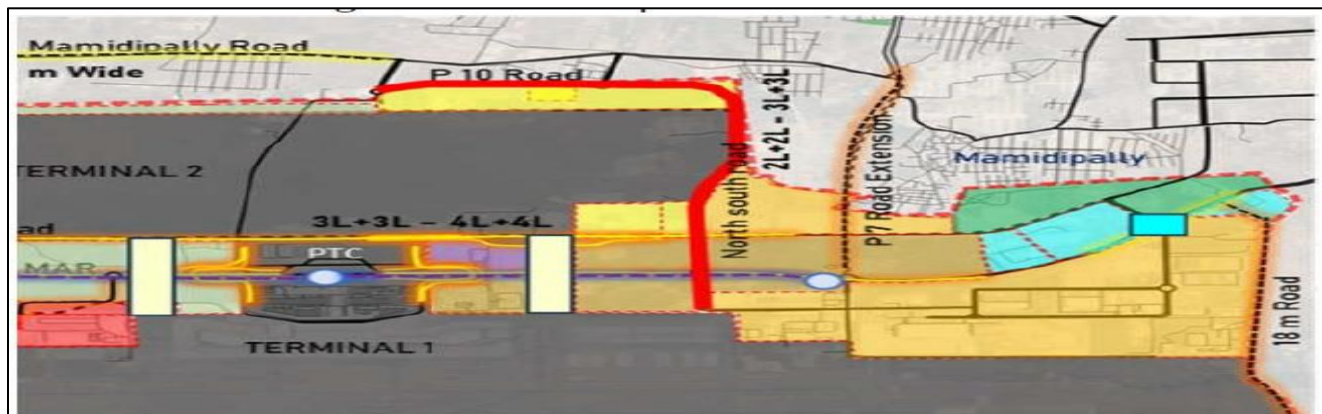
Proposed Layout of Widening of the North-South (N-S) Road Connecting Terminal 1, Terminal 2, and Mamidipally Road
